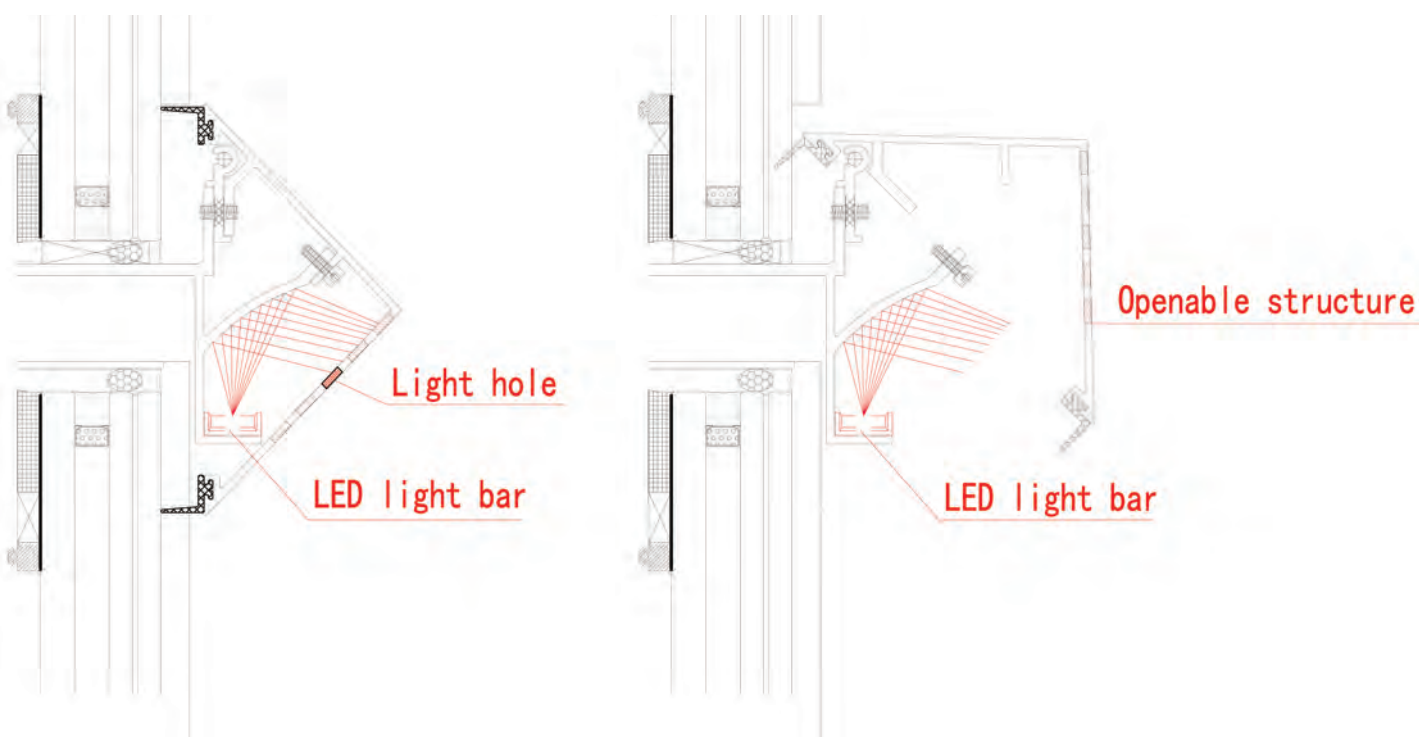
Installation mode diagram of lateral decorative wing lights on the curtain wall at the building corner (Source: Beijing Fortune Lighting System Engineering Co., Ltd.)
